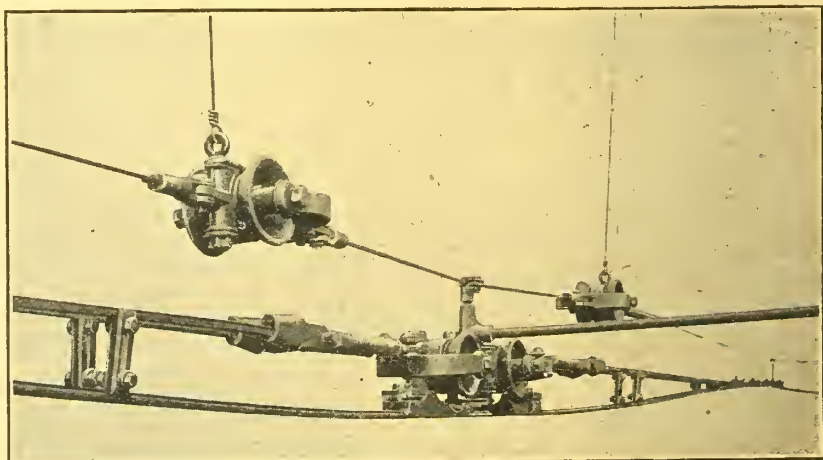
DETAIL VIEW OF SECTION INSULATOR
